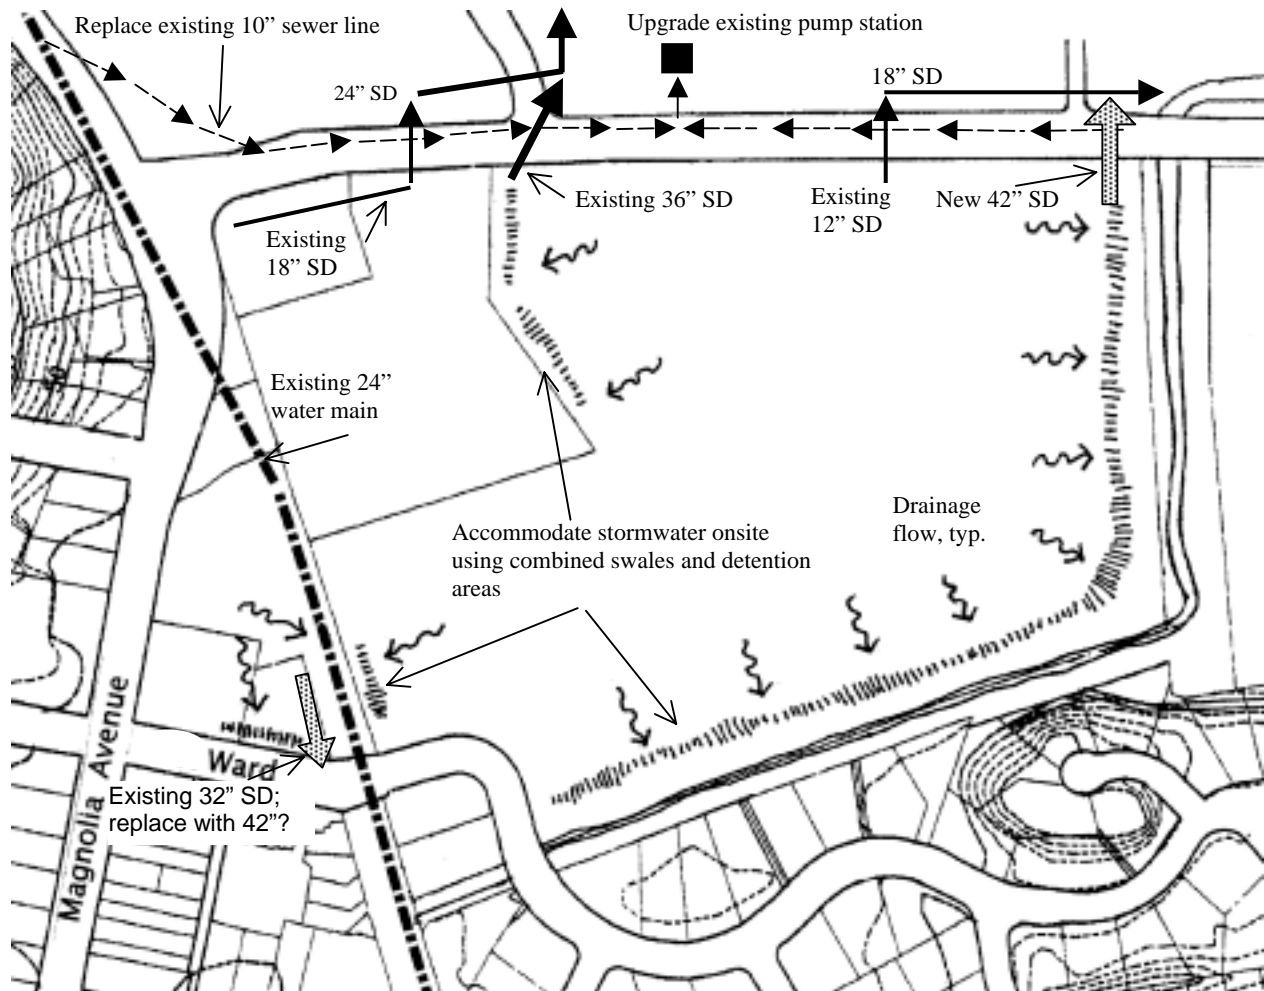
Existing and Required Utility Improvements (SD = storm drain)
